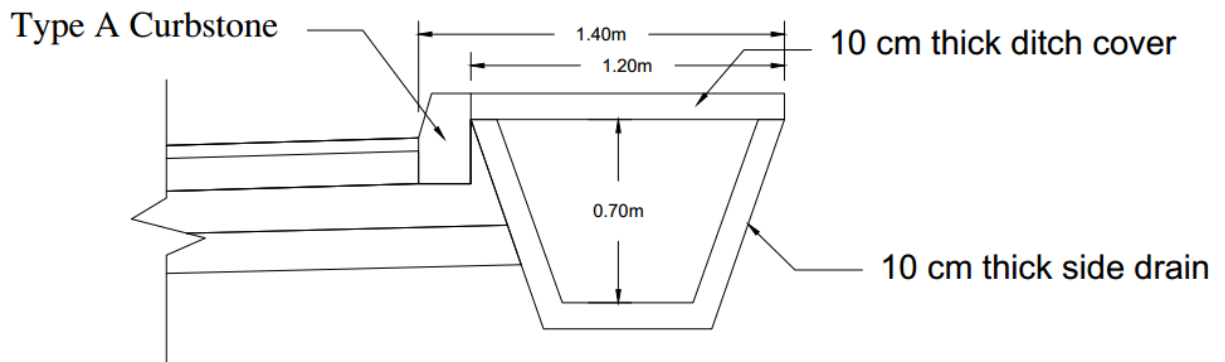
Trapezoidal Ditch at Areboch Tera – Jebena
